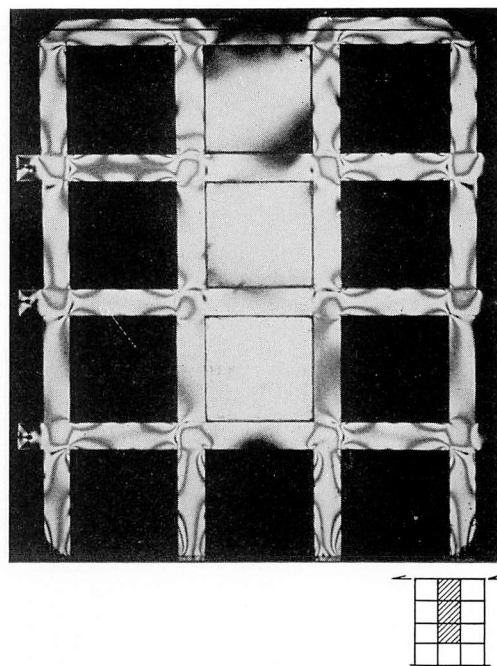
a Isochromatics of Frame with three Wall Panels Subjected to Lateral Forces on Roof Beams
